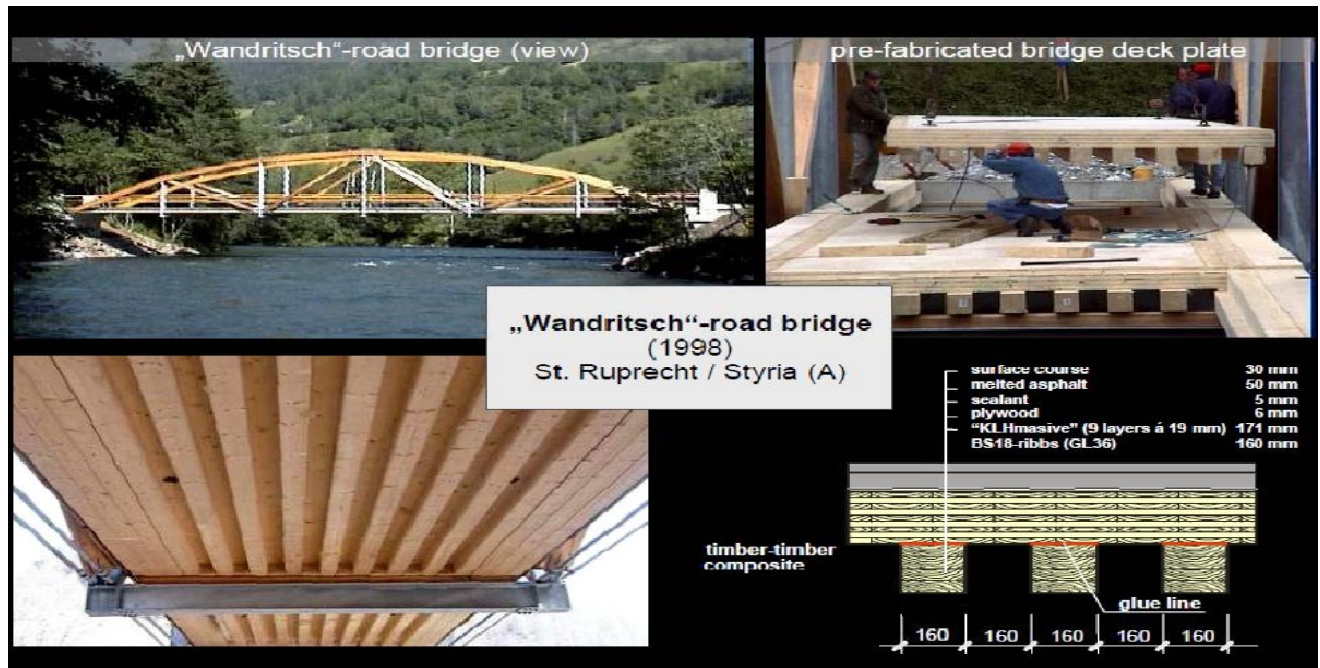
CLT Used as Decking in Wandritsch Road Bridge [5]
